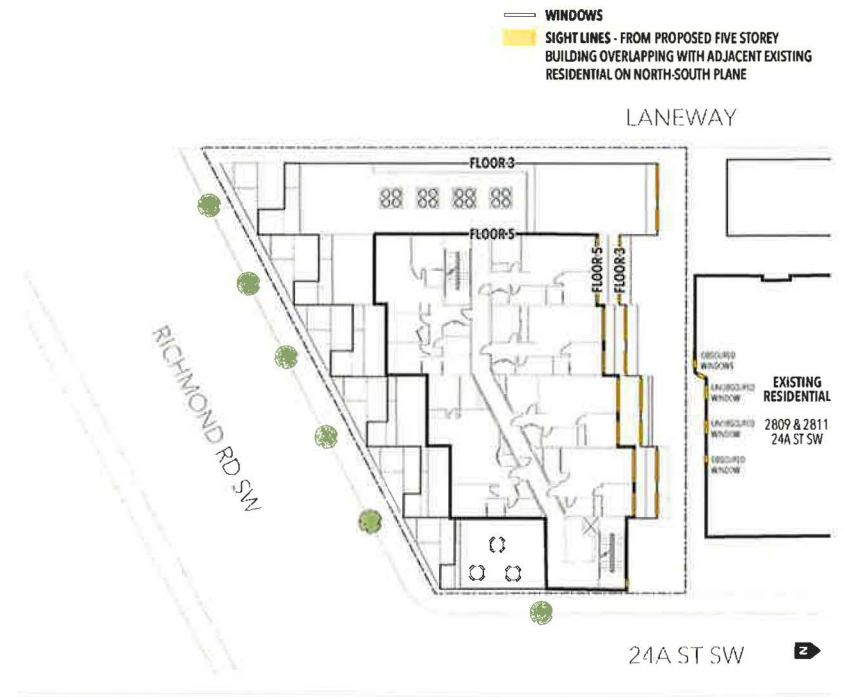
FLOOR 5 PLAN | FLOORS 3 & 5 WINDOWS
